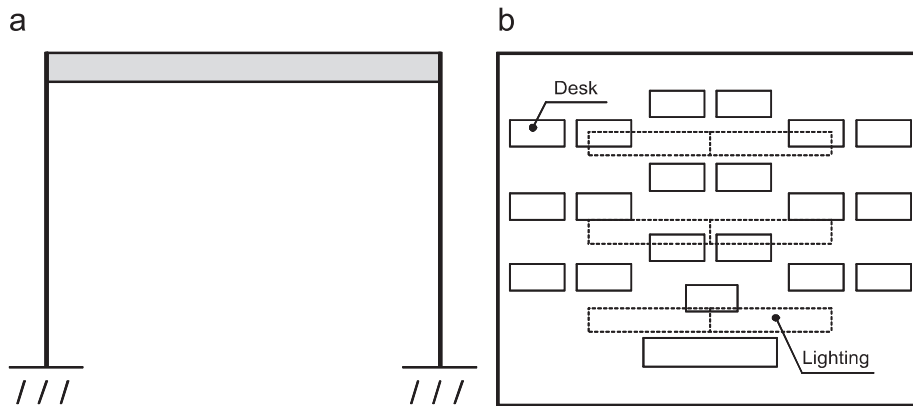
Structural scheme for the school building (a) and classroom layout (b), modified from [11].
